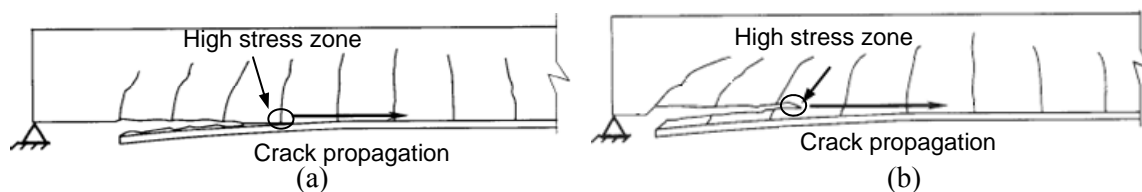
End debonding: (a) anchorage failure and (b) concrete rip-off failure.
